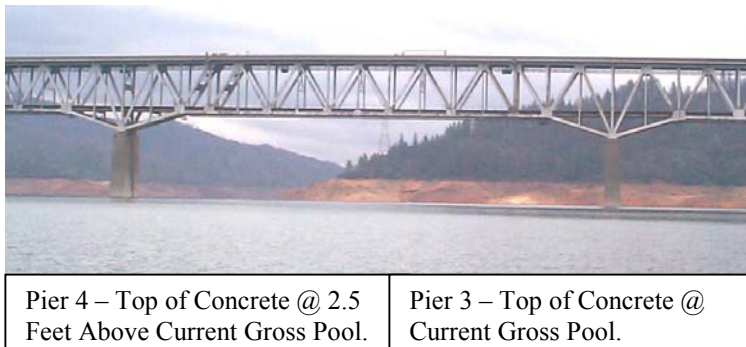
Pit River Bridge Looking East – 18 December 2002.
